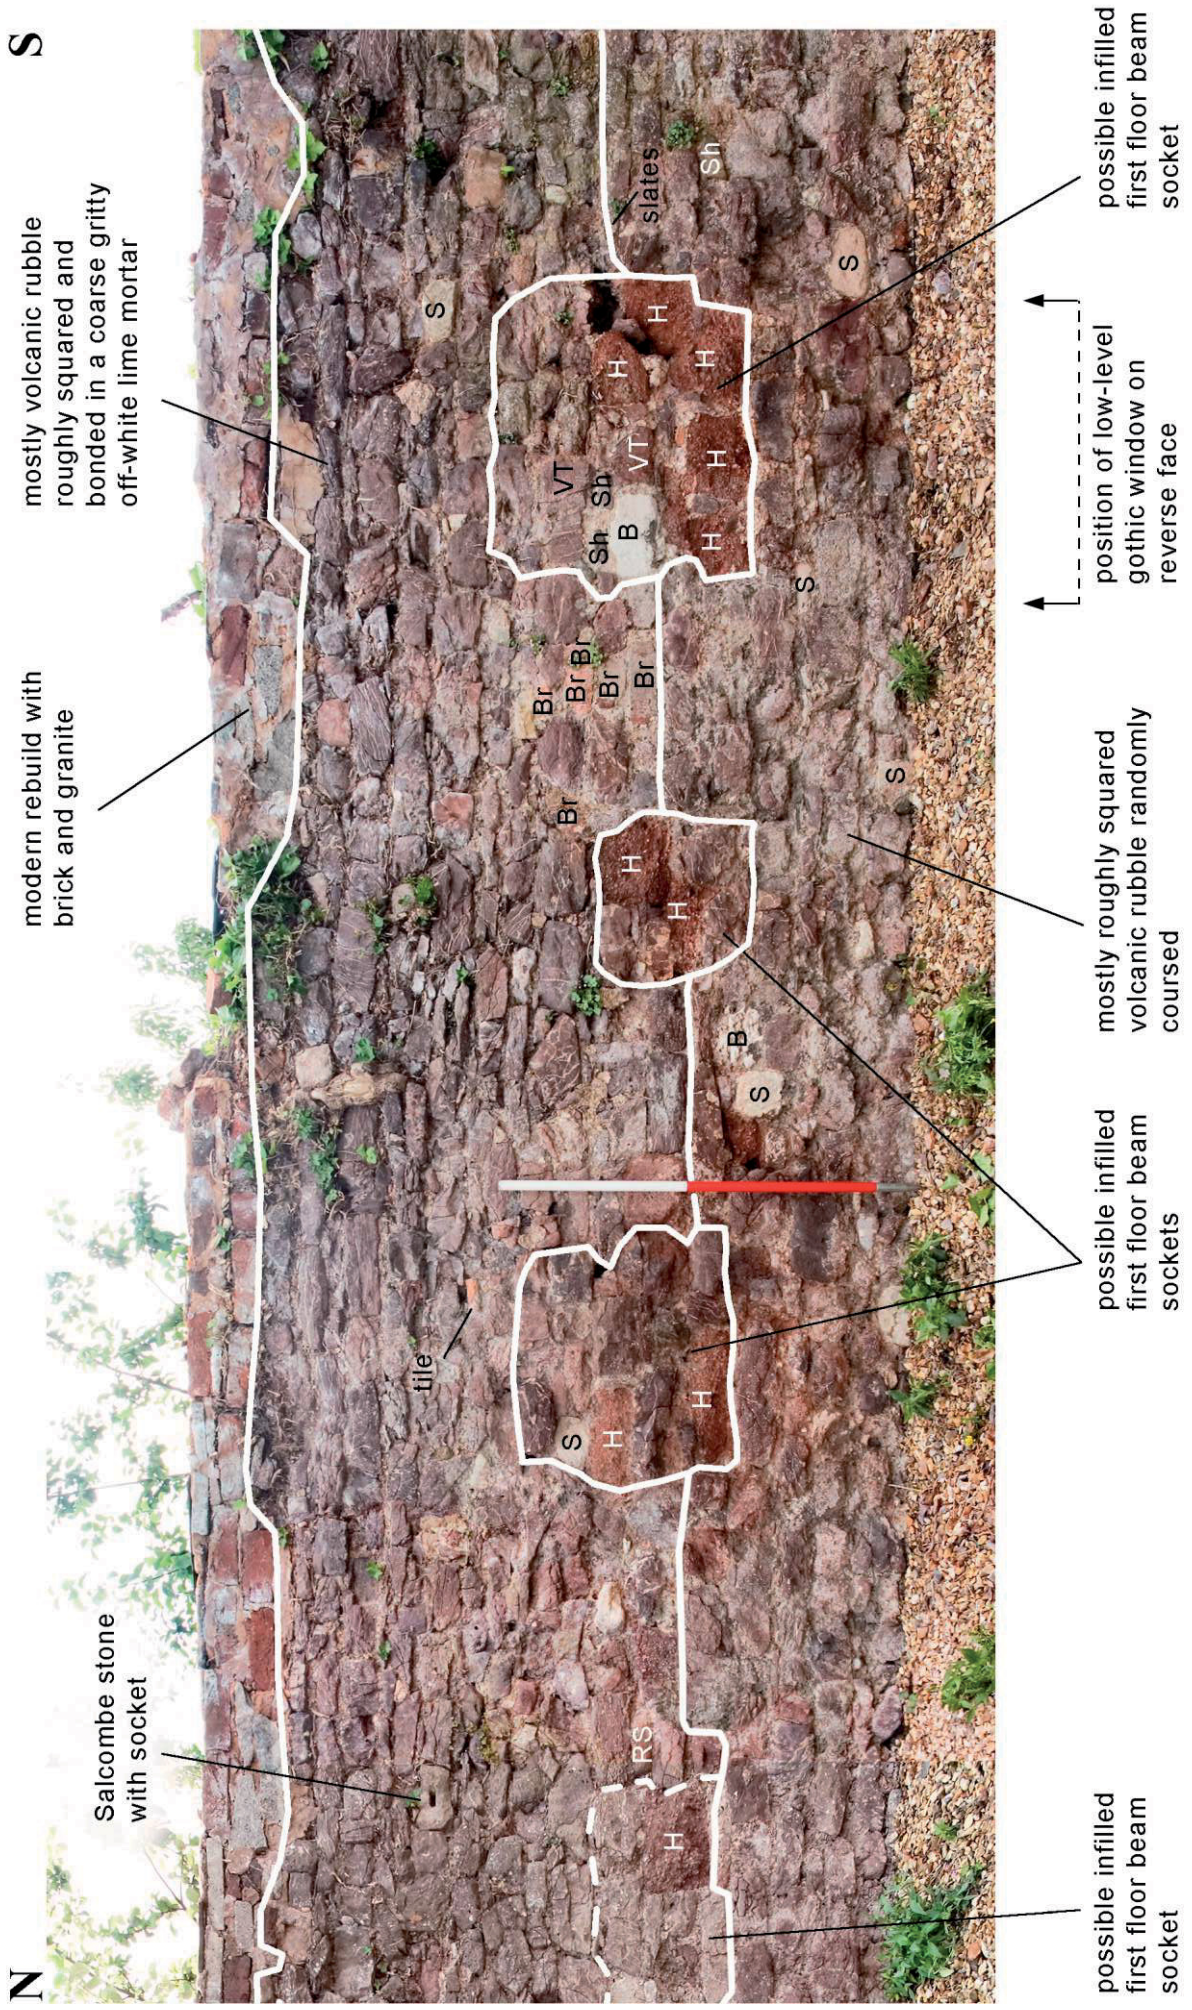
View of the north-western elevation of the central section of the boundary wall, showing the blocked joist sockets at first-floor level. Scale 1m. (See Fig. 21 for masonry key.)
